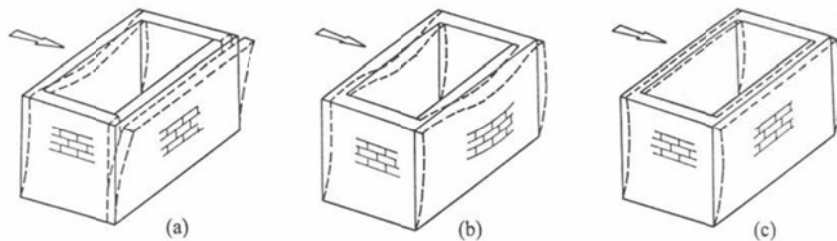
Effect of types of diaphragm on face-loaded walls – a) inferior wall-to-wall connection and no diaphragm, b) good wall-to-wall connection and ring beam with flexible diaphragm, c) good wall-to-wall connection and rigid diaphragm (Picture from NZSEE, Corrigenda 4 April 2015).
